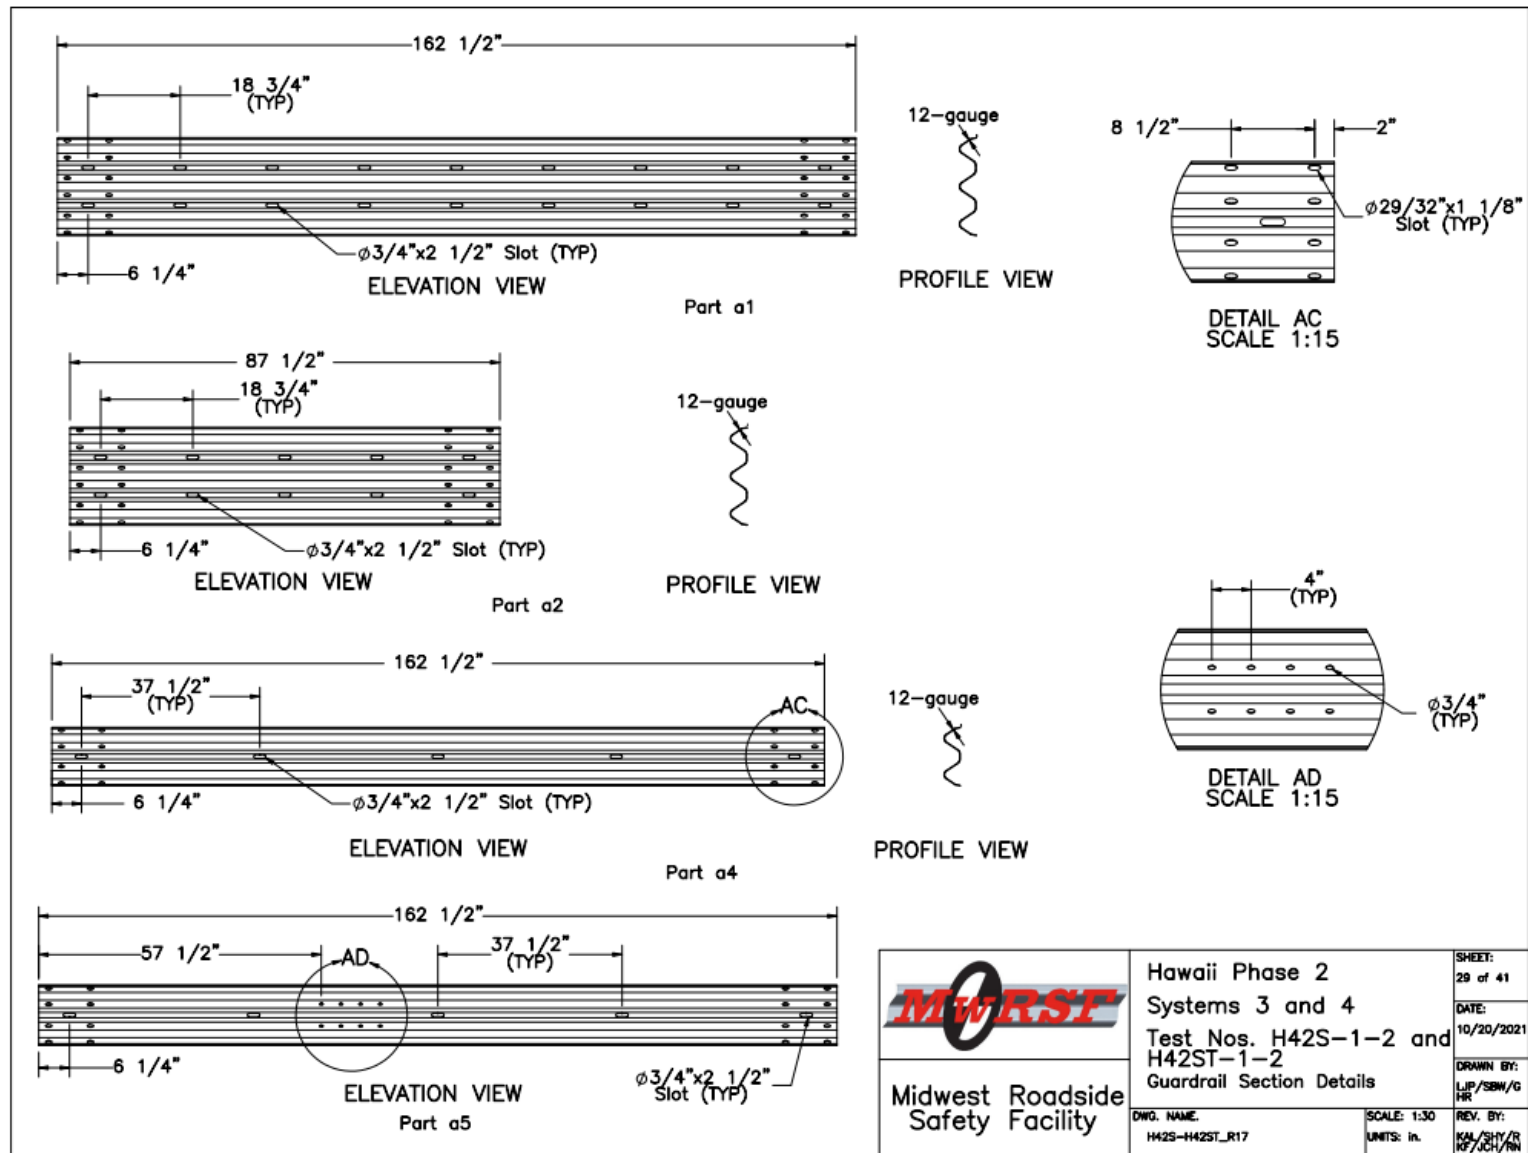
Guardrail Section Details, Test Nos. H42ST-1 and H42ST-2
